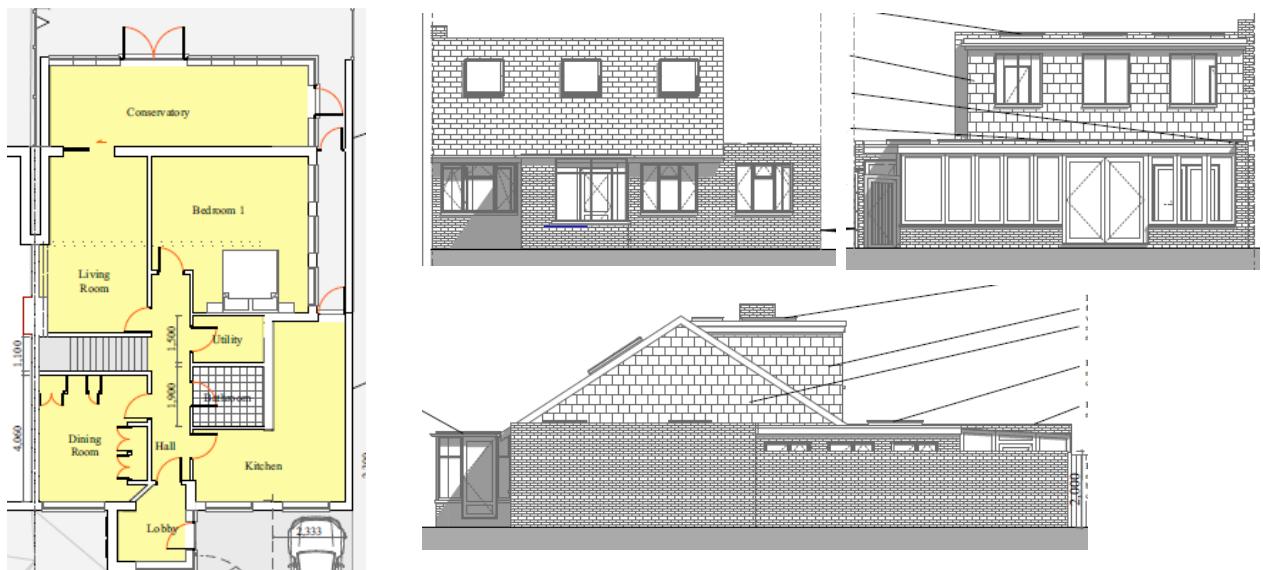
Previous Proposed Plans (20/00693/FULL6) – Dismissed on Appeal
